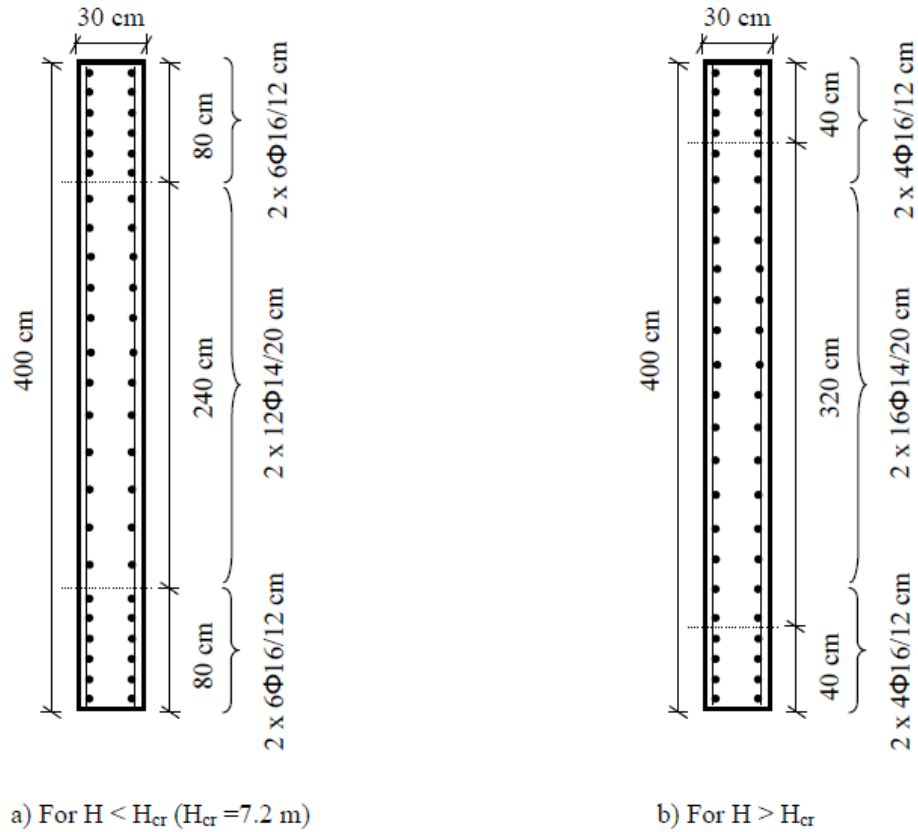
Cross-section details of shear walls of the twenty story wall-frame building
